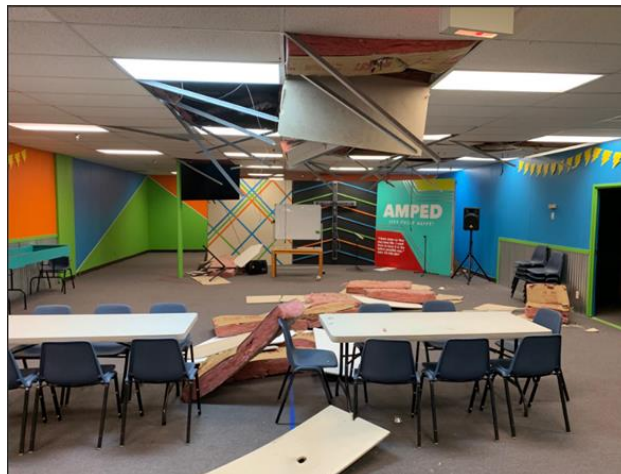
Suspended ceiling damage at Baptist Church in Ridgecrest³⁸
